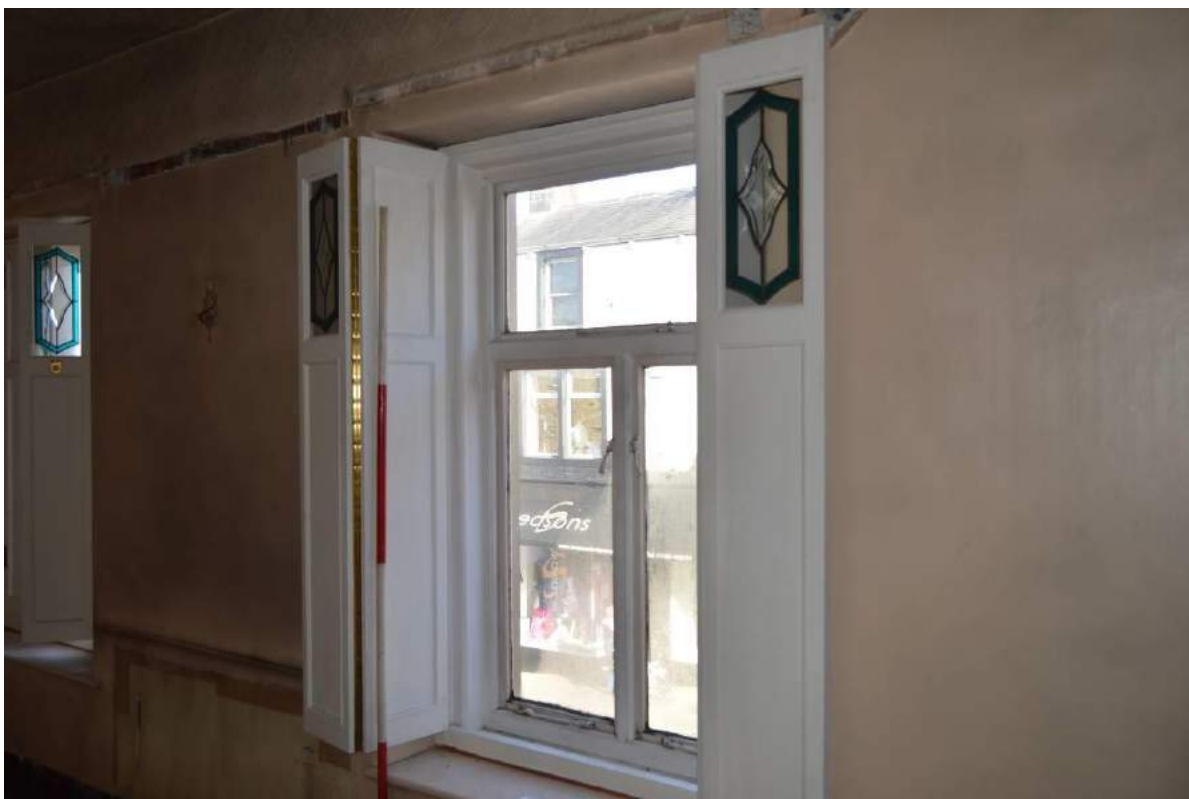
View of the front, first floor room window in north east elevation (Scale: 1 x 2m).
